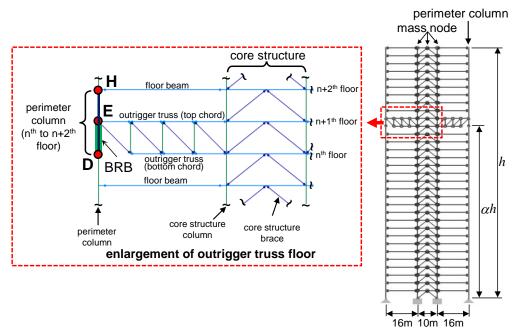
Elevation and enlarged BRB-outrigger detail of MBM model
